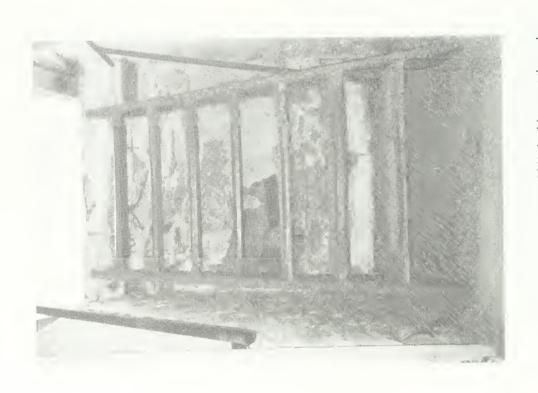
Cellar hall (Room 001), iooking east through doorway D002 at bulkhead stairway.
